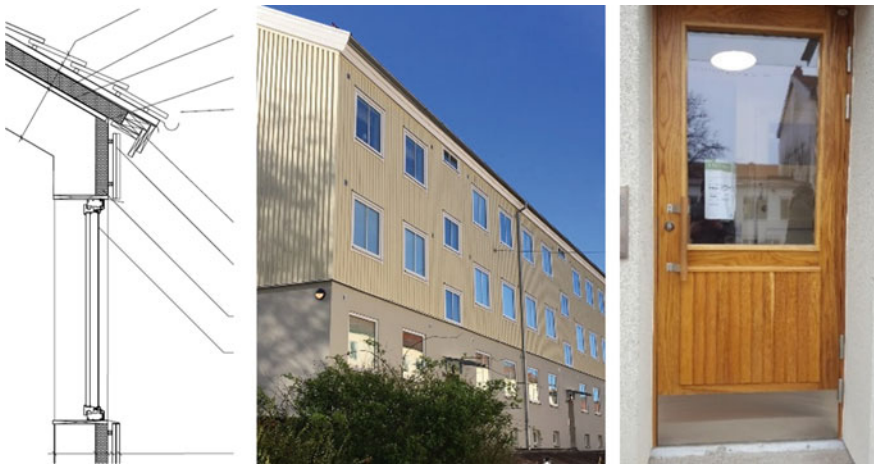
Detail of the roof to wall connection and the wall design (left, building permit, 2015-04-09), Case A with recessed windows in the basement floor (middle) and new doors (right)
